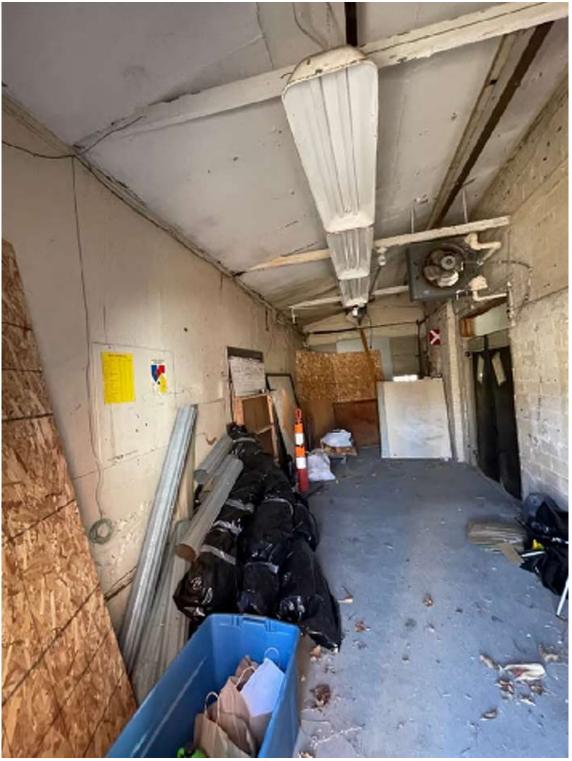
A wood framed "Lean-to" addition was found on the rear (East) side of Building and was in average condition. Much of the structure was covered and not exposed for review.
